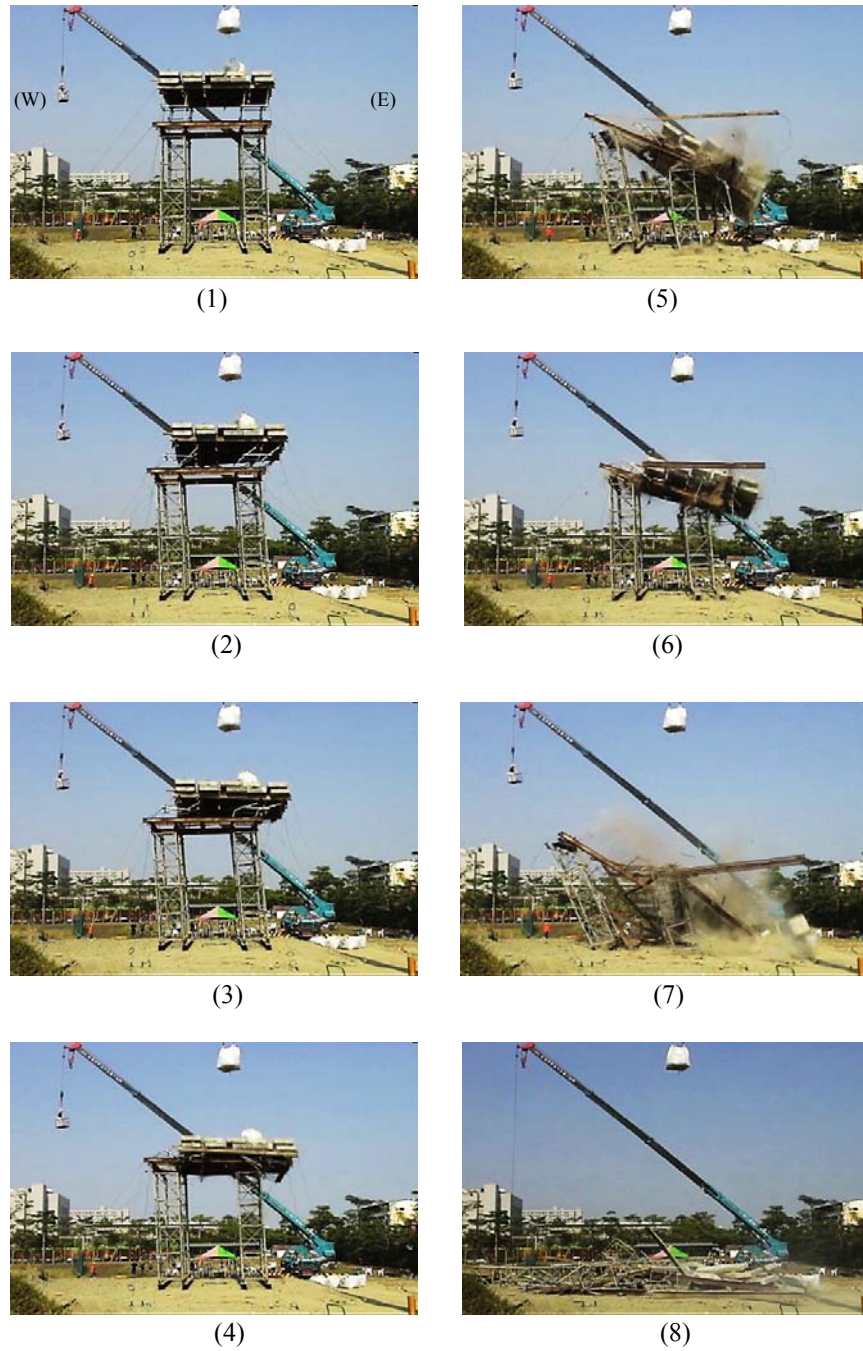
A. Collapse of Outdoor Heavy-duty Scaffolds with Shores under Loading, as Recorded by Camera on the South
